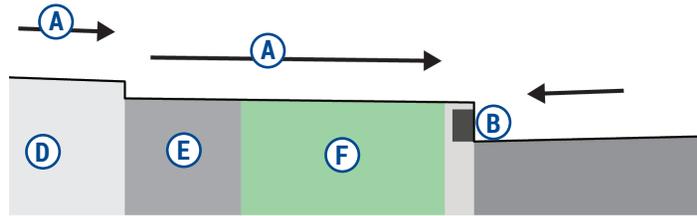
Elevation cross-section example 1, with drainage directed to roadway catch basin
